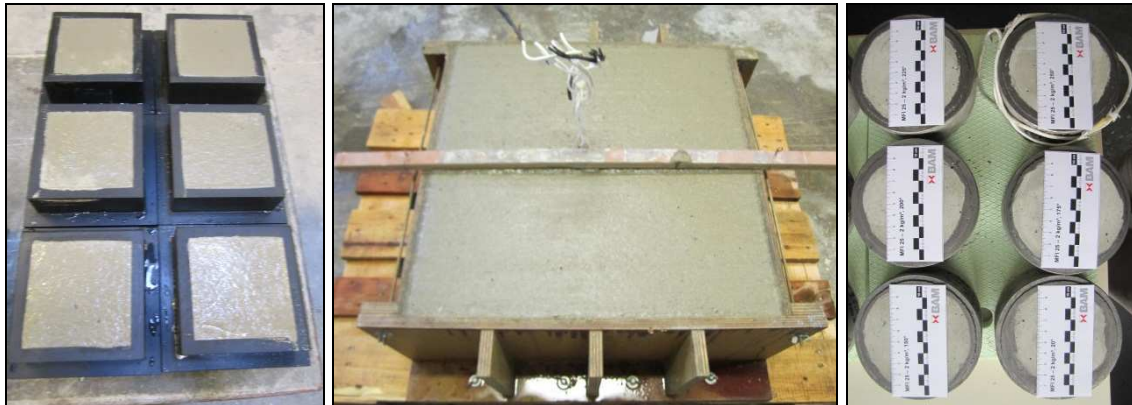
From left: cubes (150x150x150)mm, block (600x600x300)mm for explosive spalling test, steel rings for permeability test (by author)
